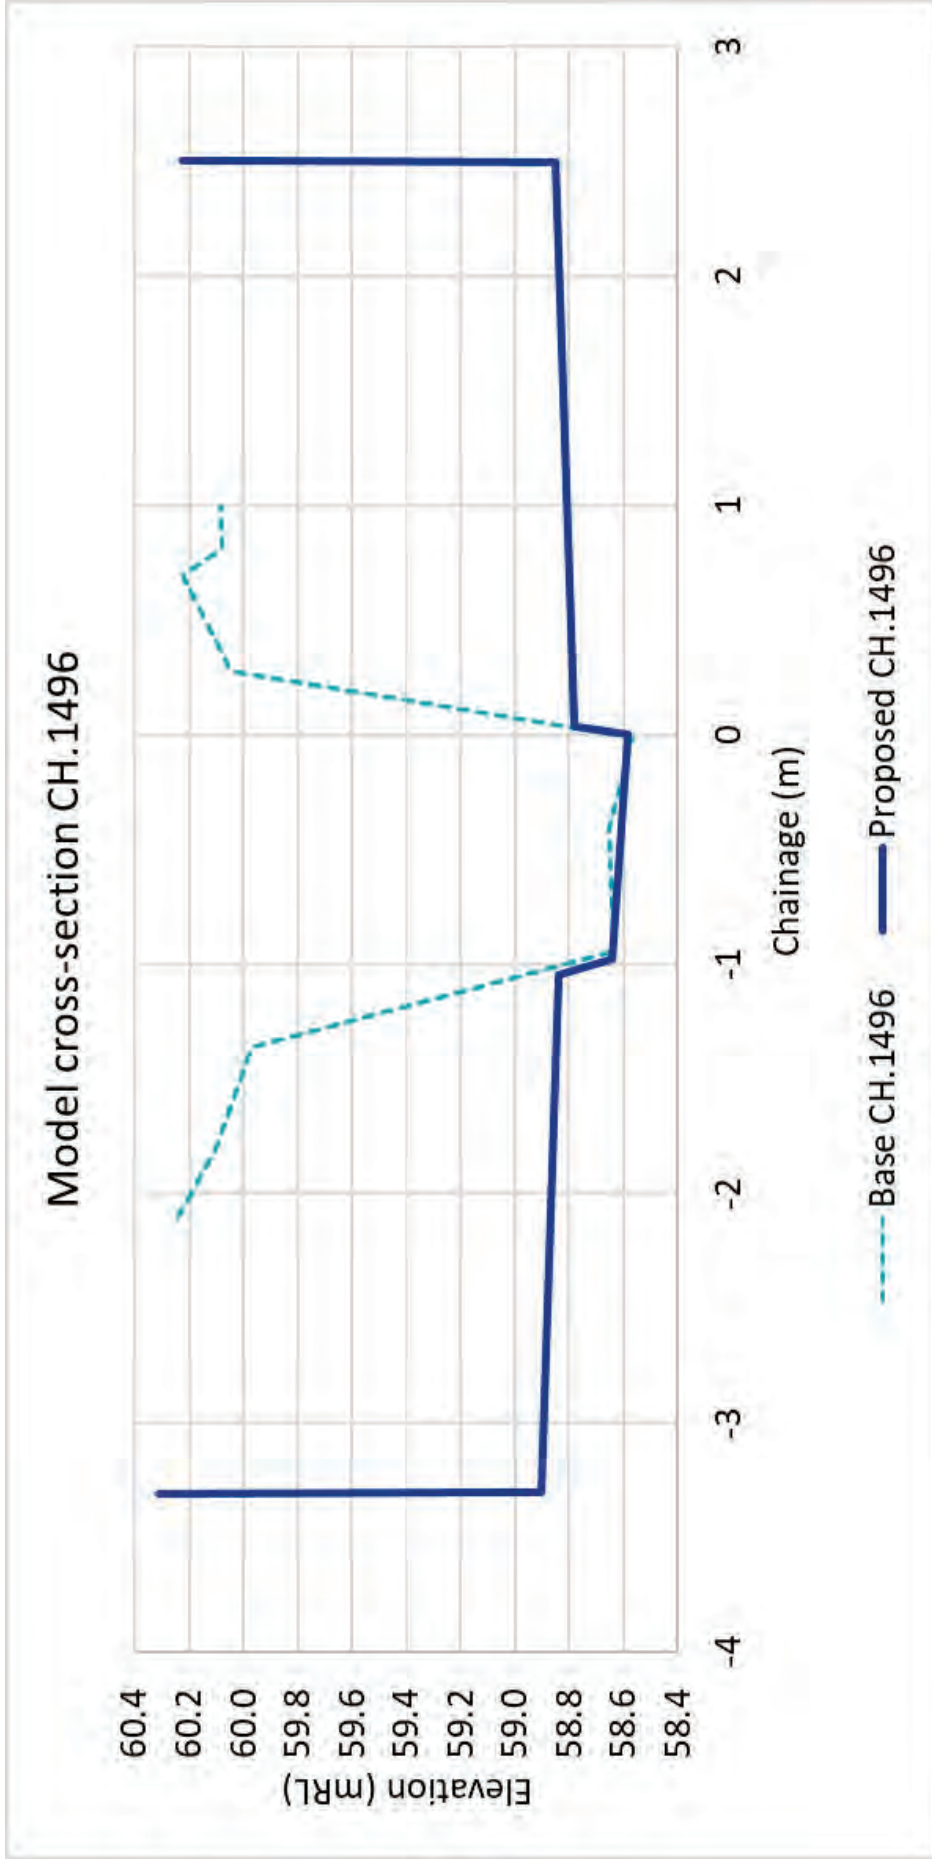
Cross-section 1496 (proposed as per June 2020)
